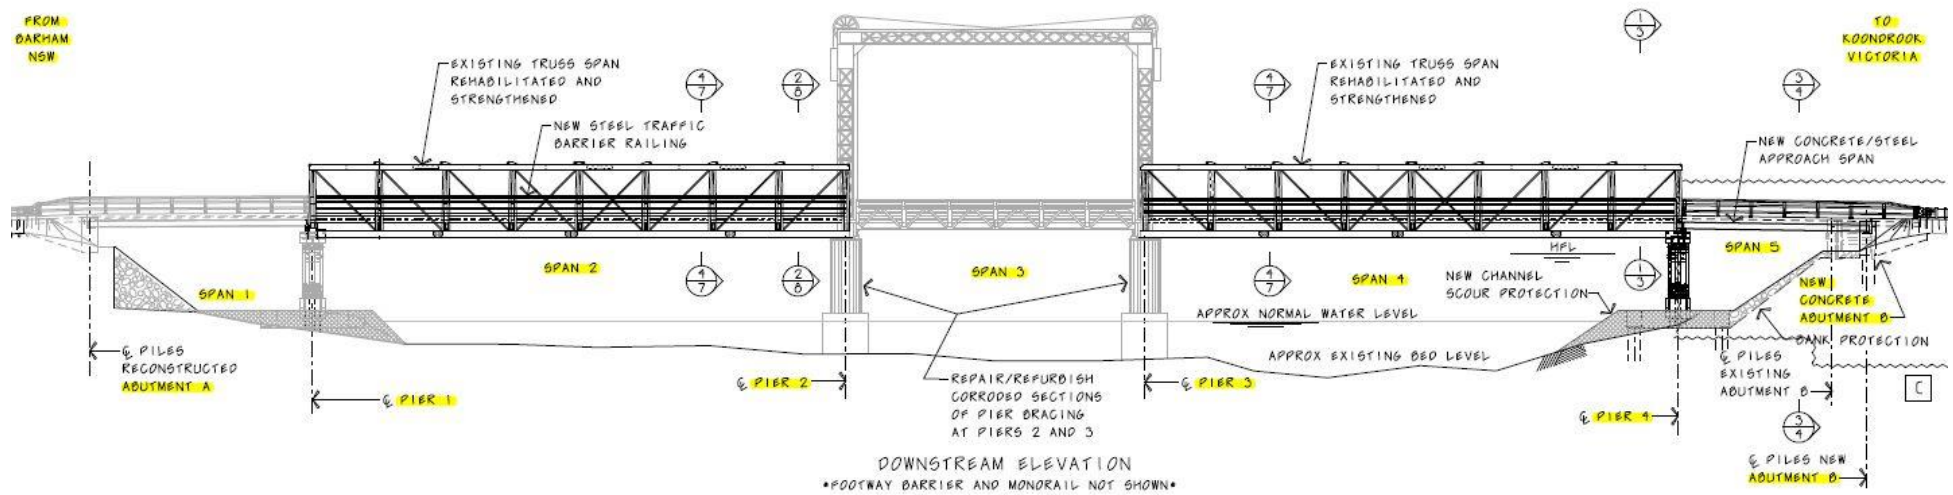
Plan of Barham-Koondrook bridge showing span and pier numbers
